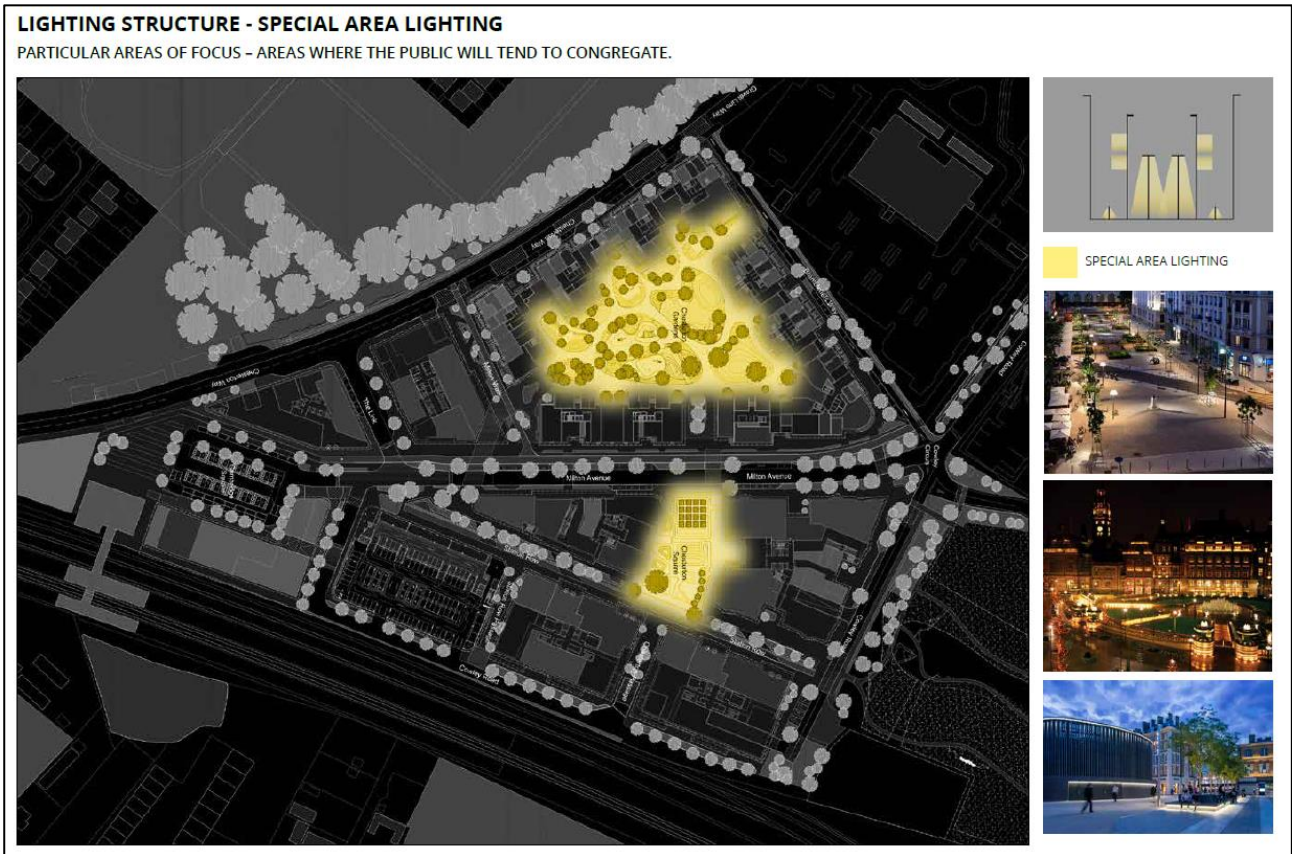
Feature lighting, these will not have any impact on the buildings and areas outside of the proposed development site.
